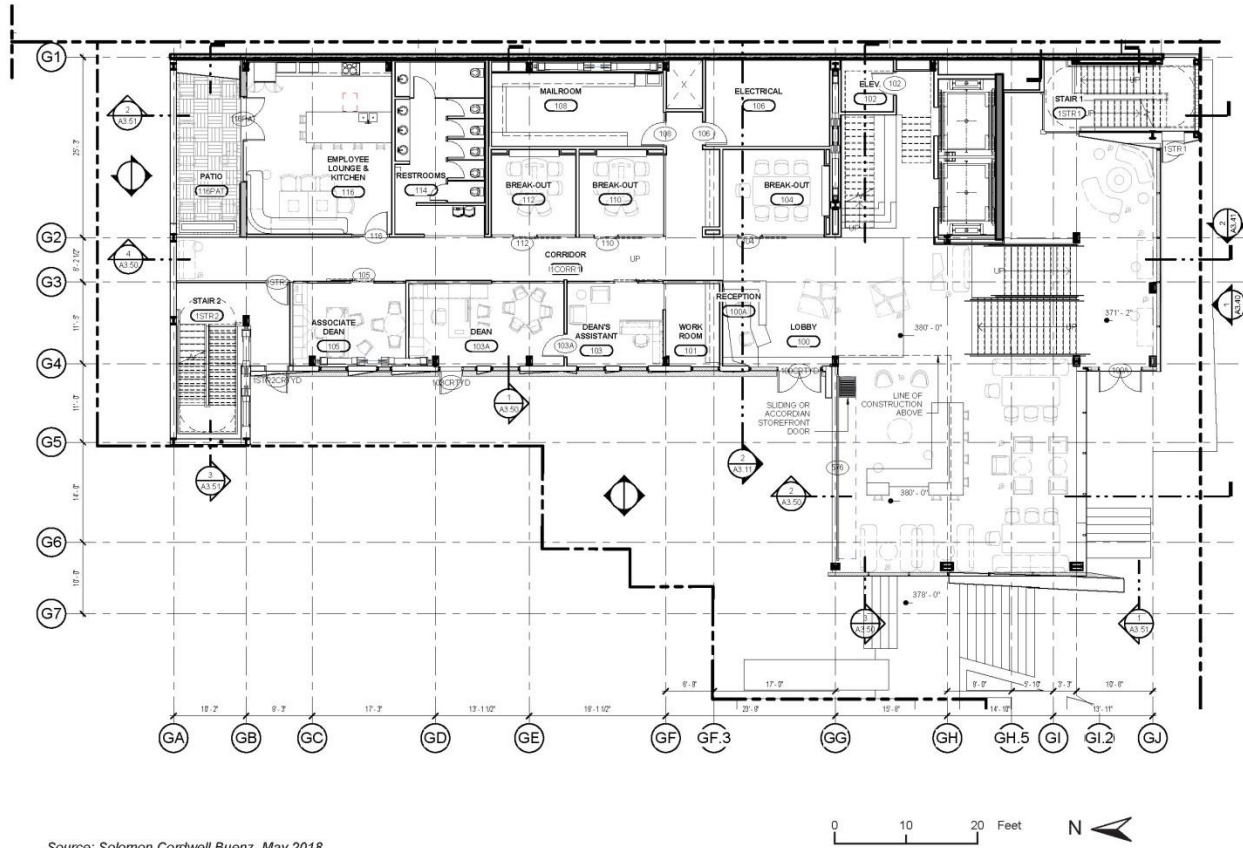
ACADEMIC BUILDING BASEMENT FLOOR PLAN
